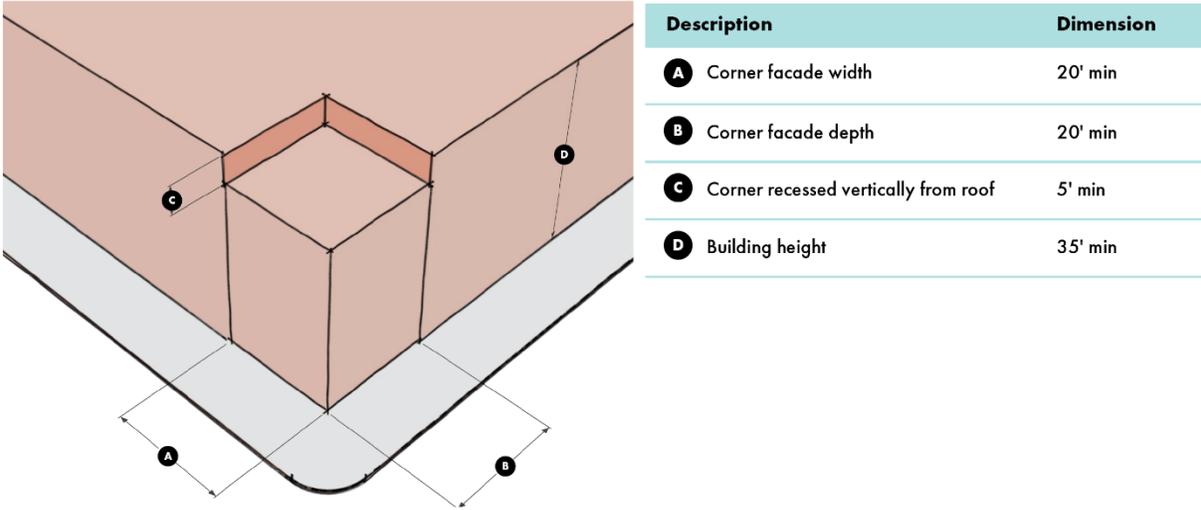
Corner of building shorter in height than the rest of the building. Pasadena, CA. Source: Gruen Associates
